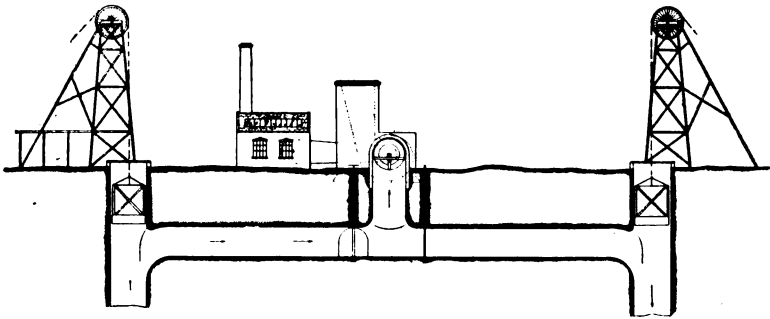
Showing how a Fan (a Sirocco) may be arranged for Reversing the Air-current Underground.
